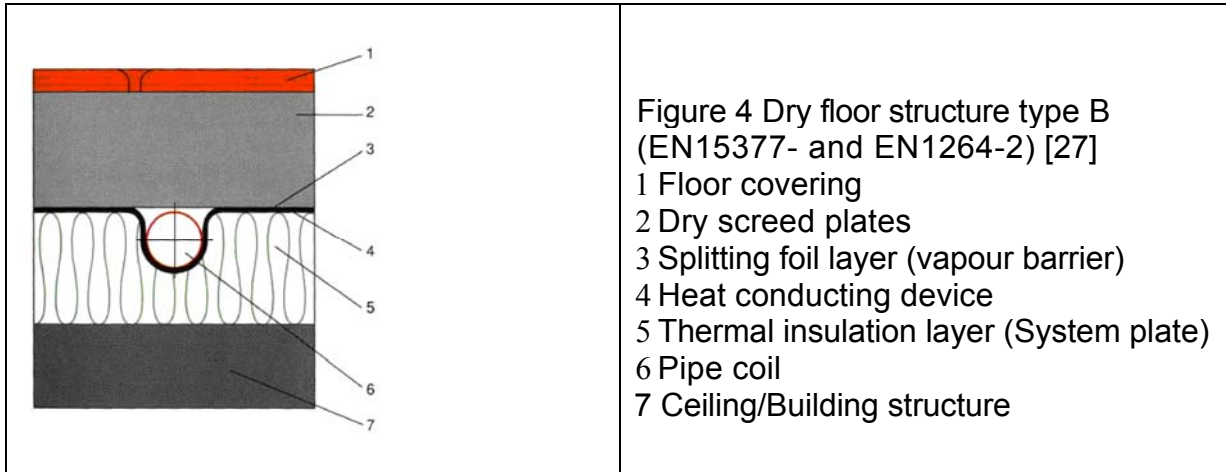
Floor structure type B (EN15377- and EN1264-2) [27]:
